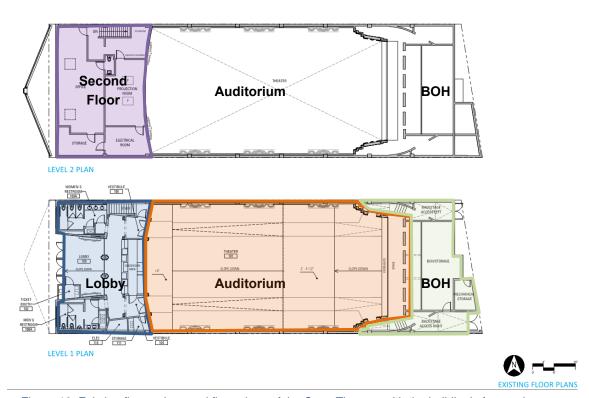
Existing first and second floor plans of the Crest Theater, with the building's four major areas highlighted and labeled. Source: BAR Architects, October 31, 2019, edited by Page & Turnbull.
